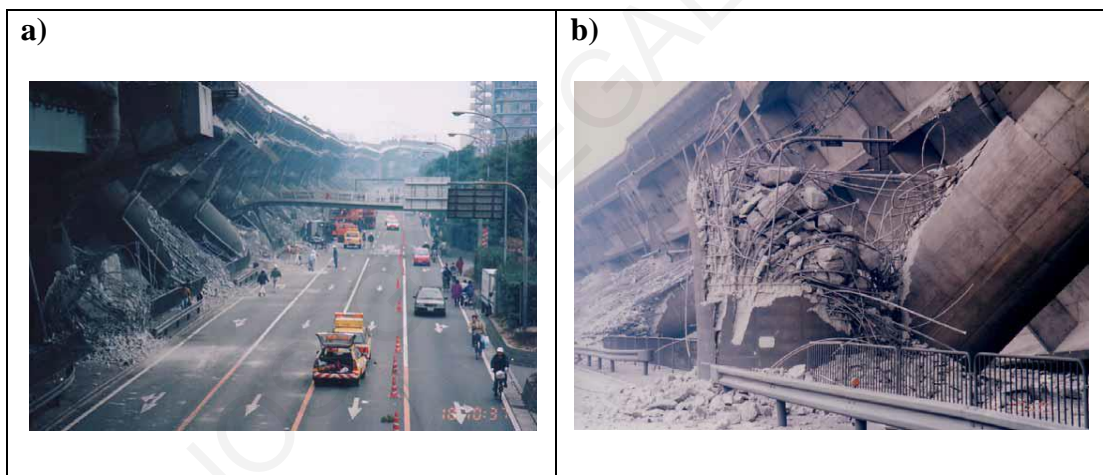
a) Collapse of Fukae Viaduct 1995 Kobe Earthquake b) Premature shear failure of reinforced Concrete bridge pier, Fukae Viaduct.
